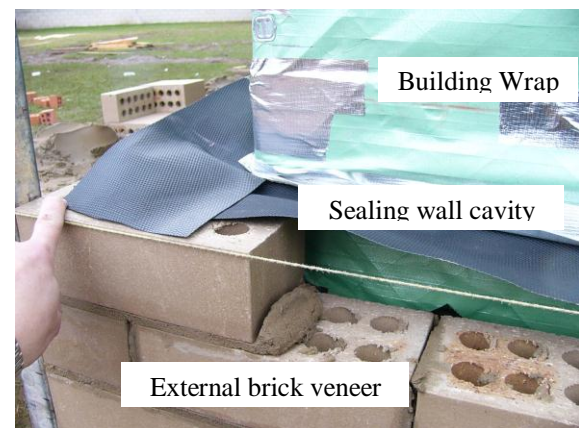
Photograph of subfloor and wall cavity separation of test cell 2
